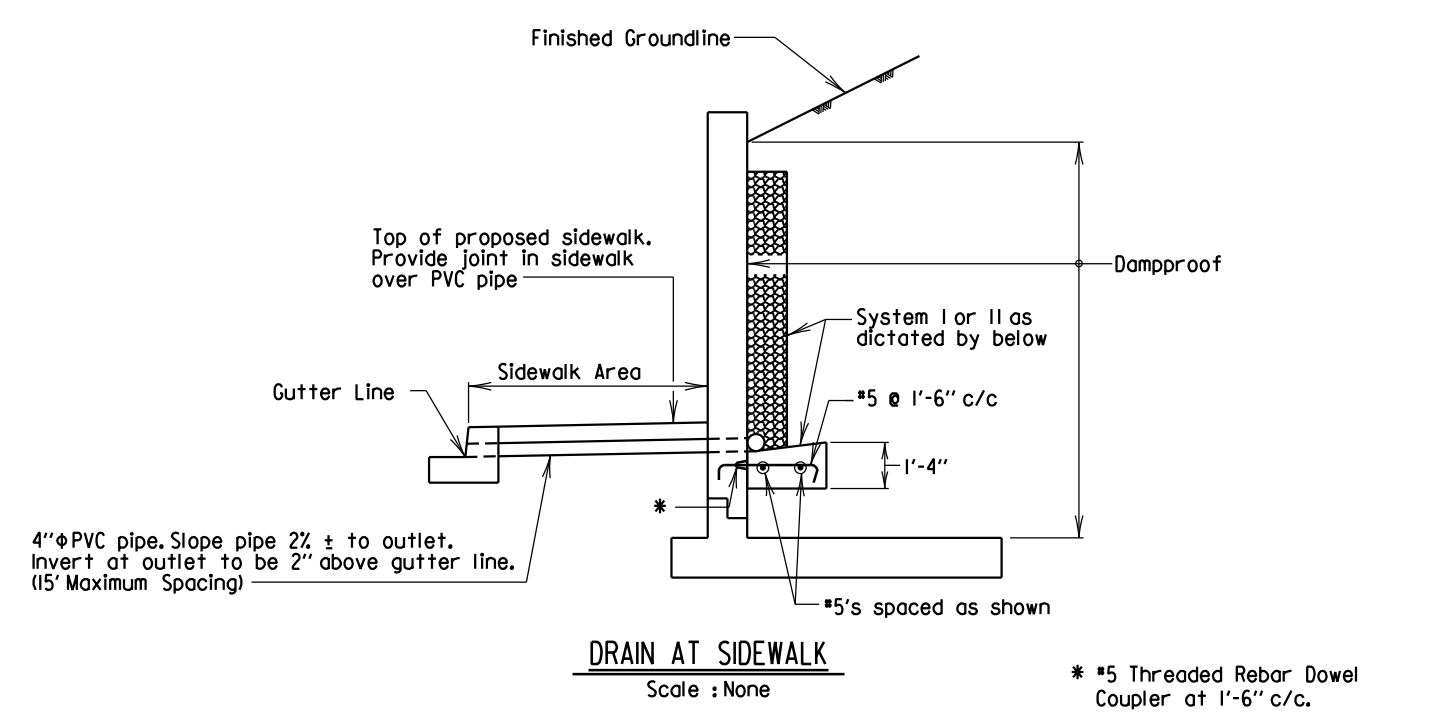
DETAIL NO. REBAR-BB-102 SHEET 1 OF 2
